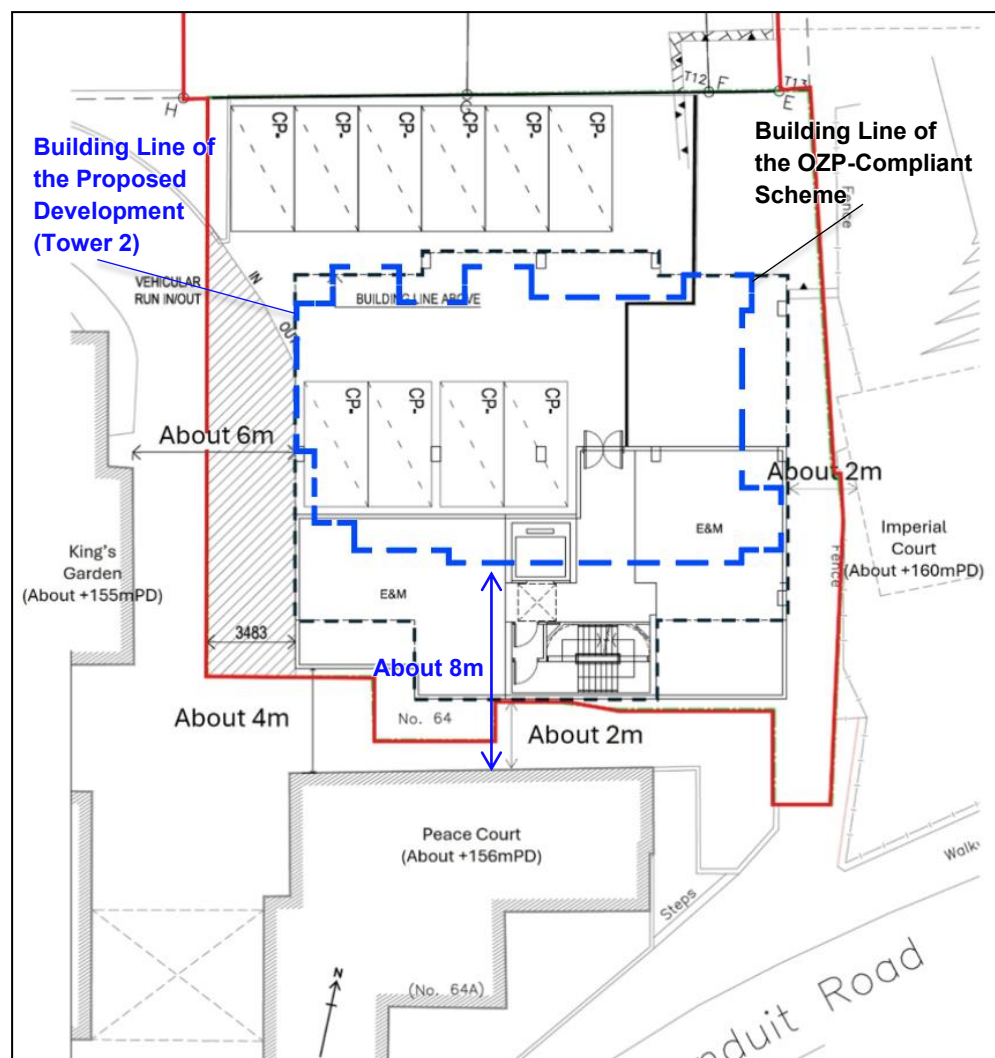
Separation Distance between Adjacent Buildings under the OZP-Compliant Scheme and Proposed Scheme
